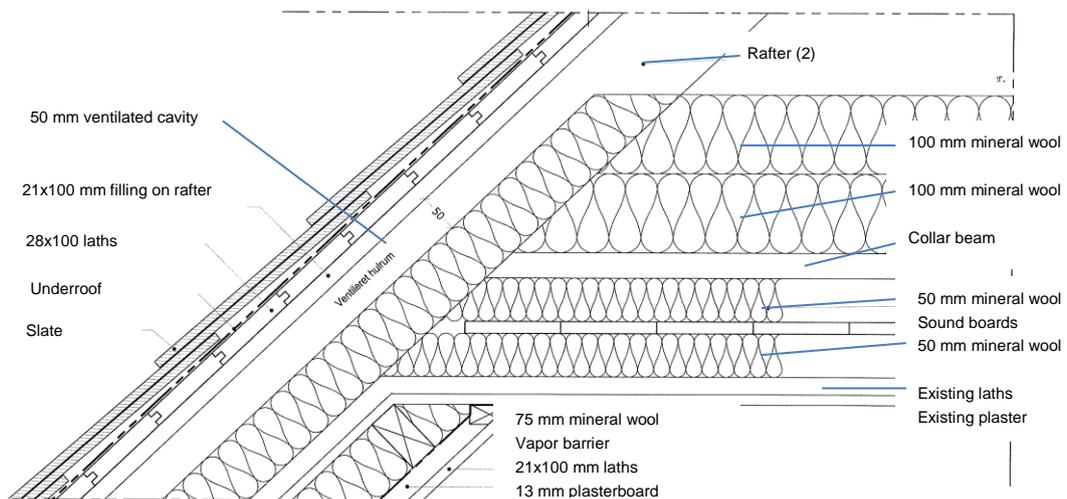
Attic floor – cross section in attic floor and sloping wall. 1 Slate, base felt, key and slot boards, laths on rafter. 2 Fungus attacked parts of rafters was replaced. 3 Attic floor with 200 mm mineral wool. 4 Collar beams were insulated both sides of sound boards.
